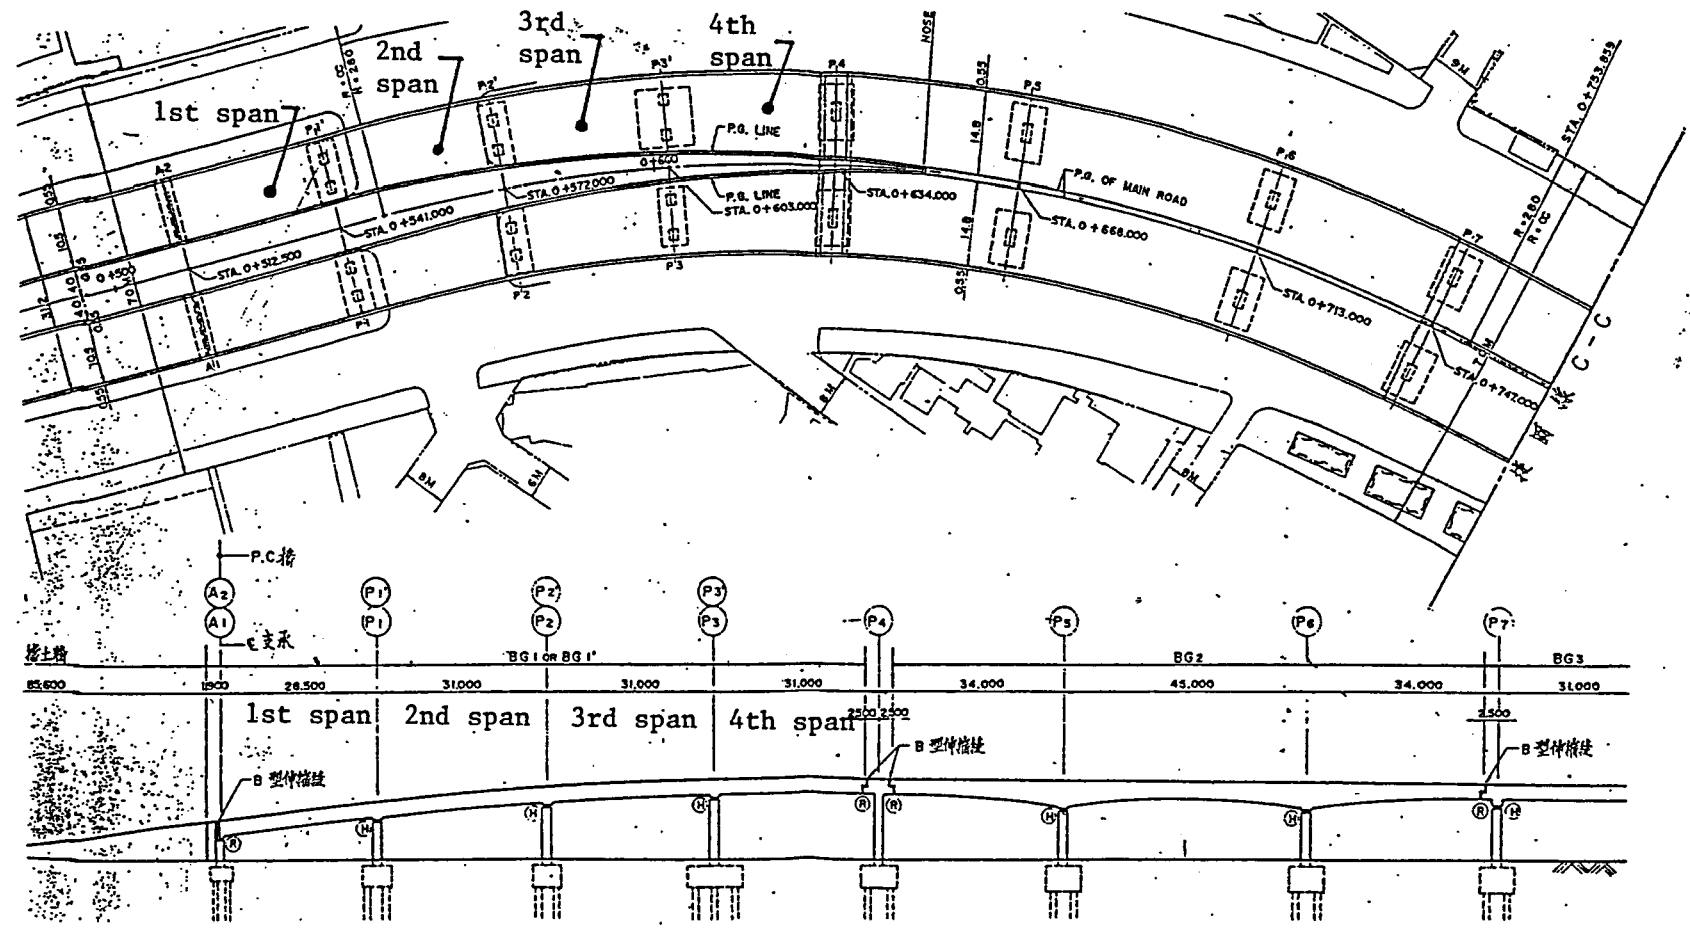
Layout plan of collapse in Taipei, Taiwan
